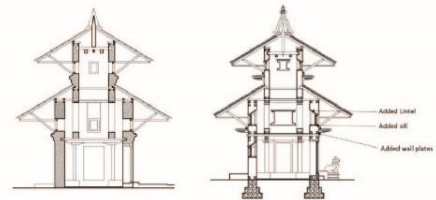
Section old (left) and new (right) showing wall plates added and increased depth of foundation
